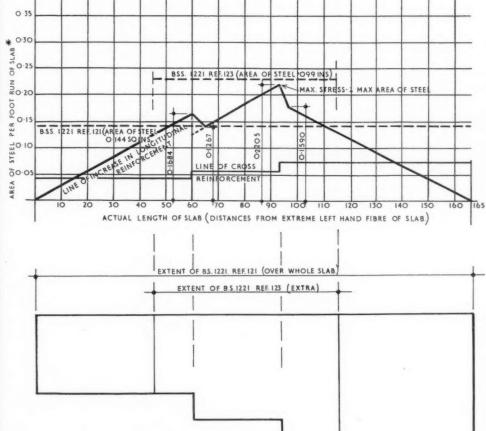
, graph (left) showing area of steel required in any given section of site slab for subsidence reinforcement. Below left, actual plan of site slab.
